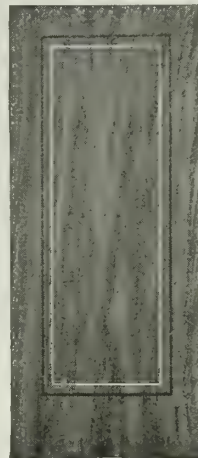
DETAIL OF CONSTRUCTION EVANS PROCESS HOLLOW SANITARY DOOR
